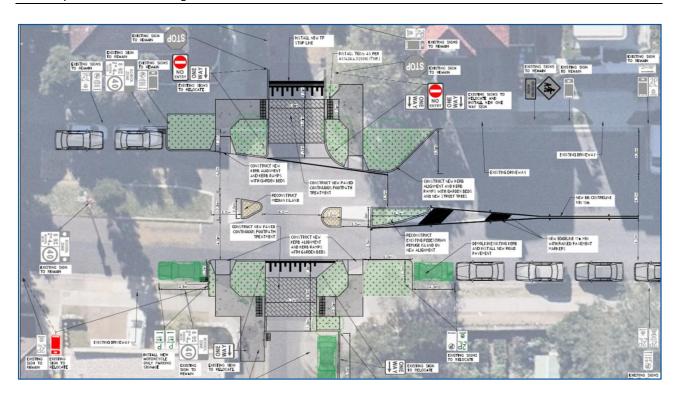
Proposed continuous footpath treatments on the intersection of Gould Street and Warners Avenue.
